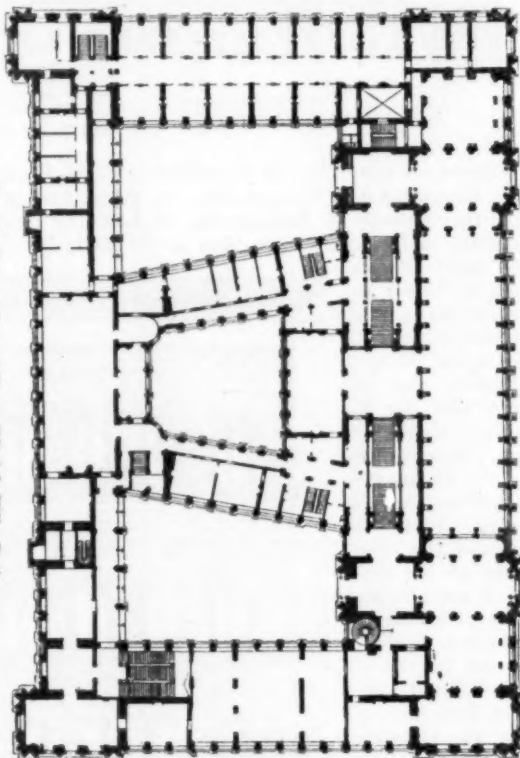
Plan of Second Floor, Hôtel de Ville, Paris.
